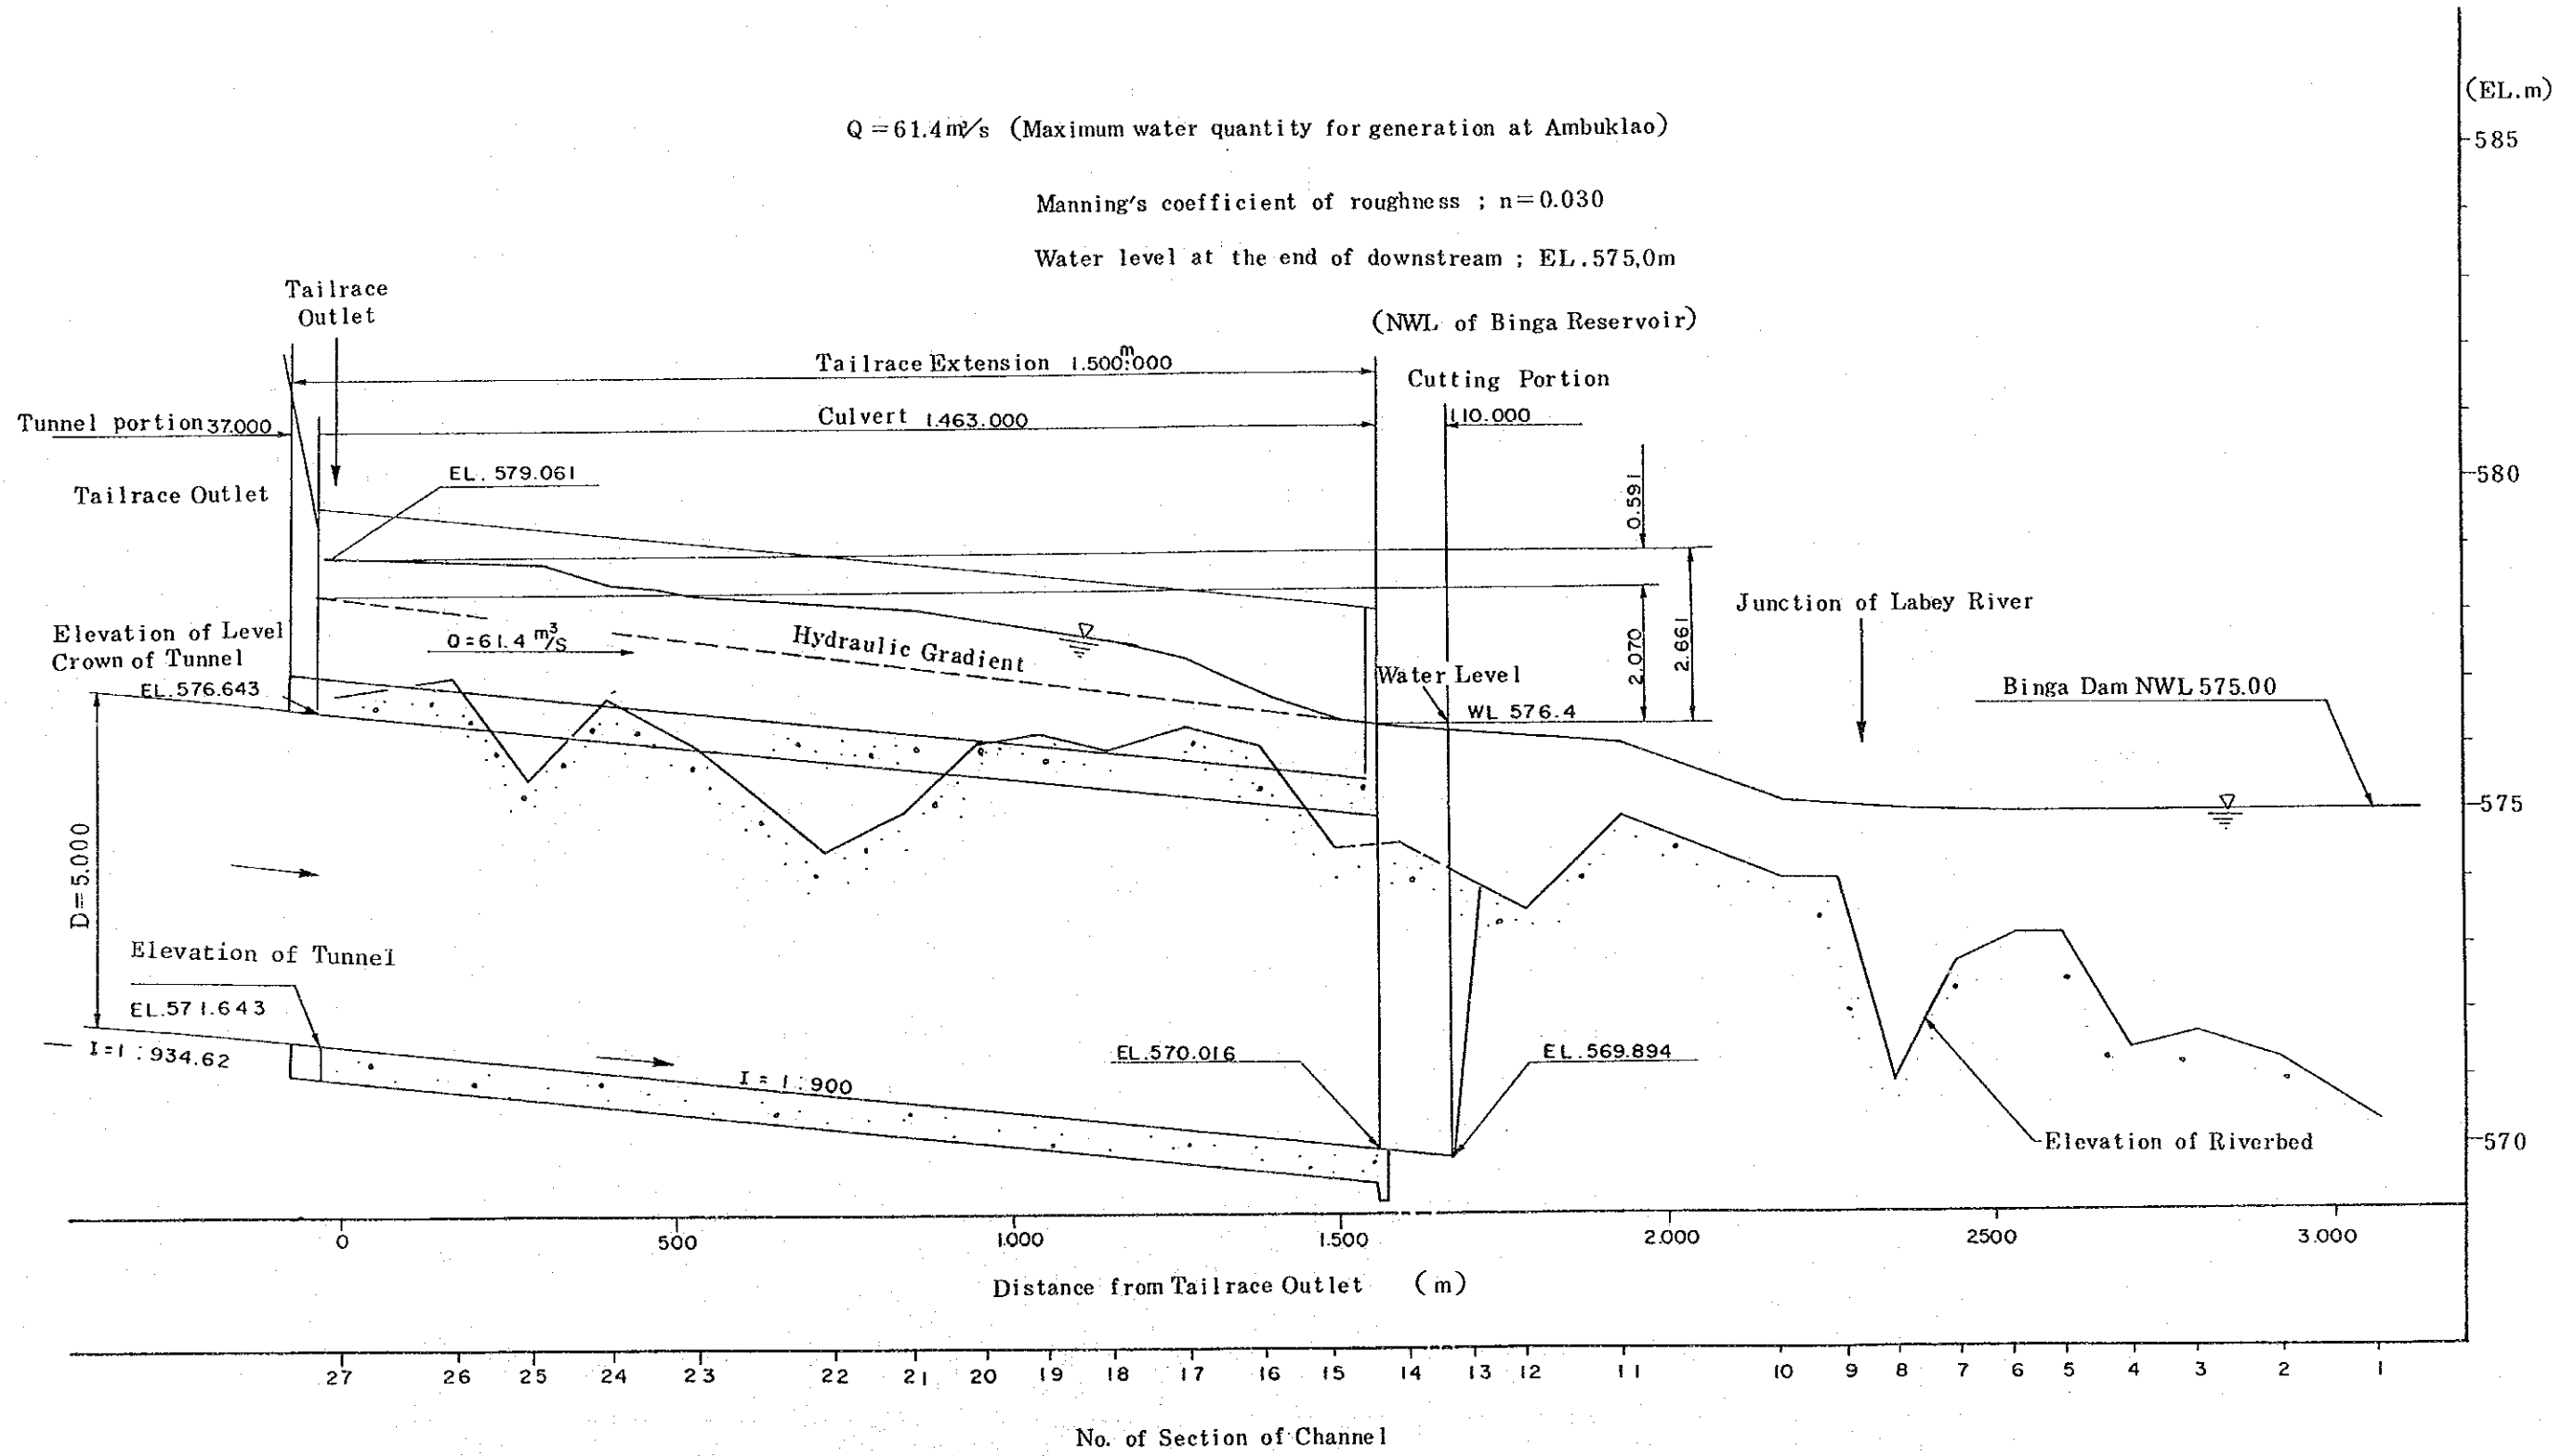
Water Surface Profile at Ambuklao Tailrace Outlet & Tailrace Extension Plan
